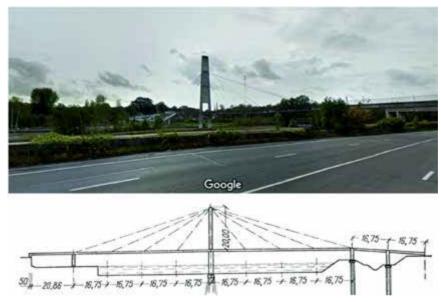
Footbridge over the Central Canal in Obourg [3,7], Belgium, 1966 (photo: Google Maps)
